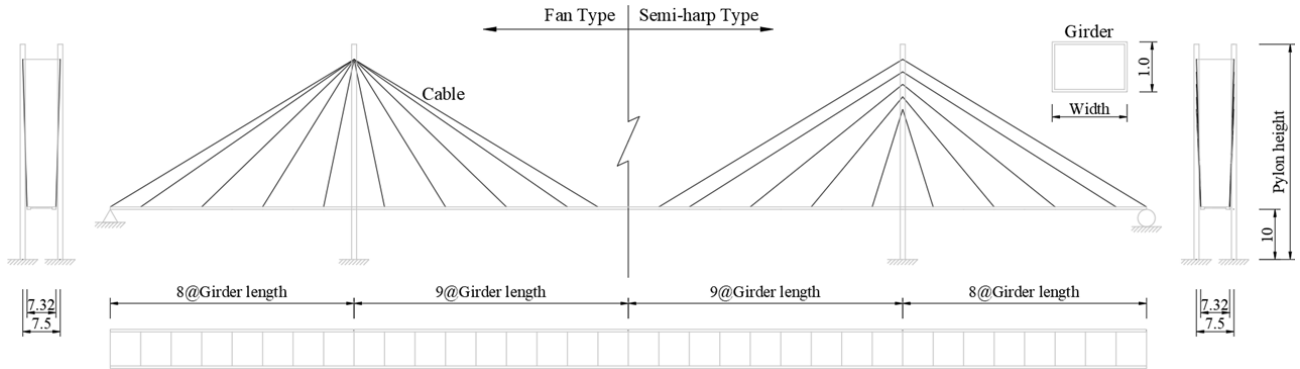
Detail of steel cable-stayed bridge for cable cross-section optimization
